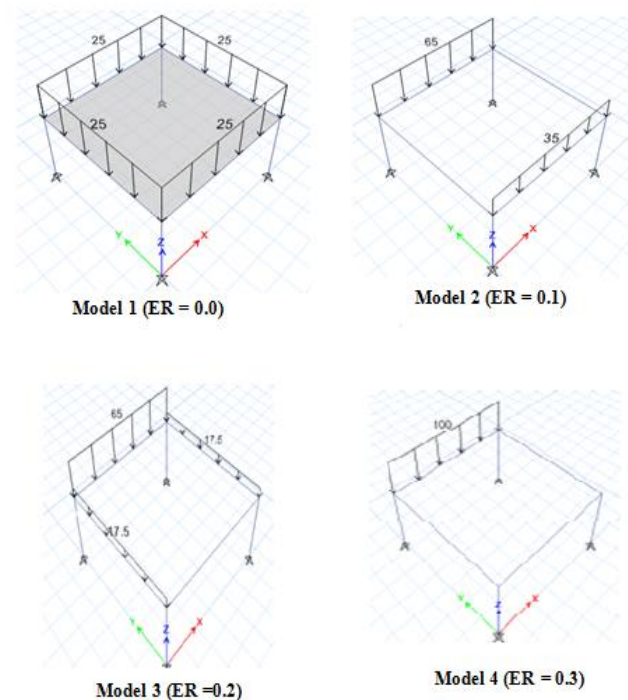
Typical loading pattern in kN/m<sup>2</sup> for single storey building
